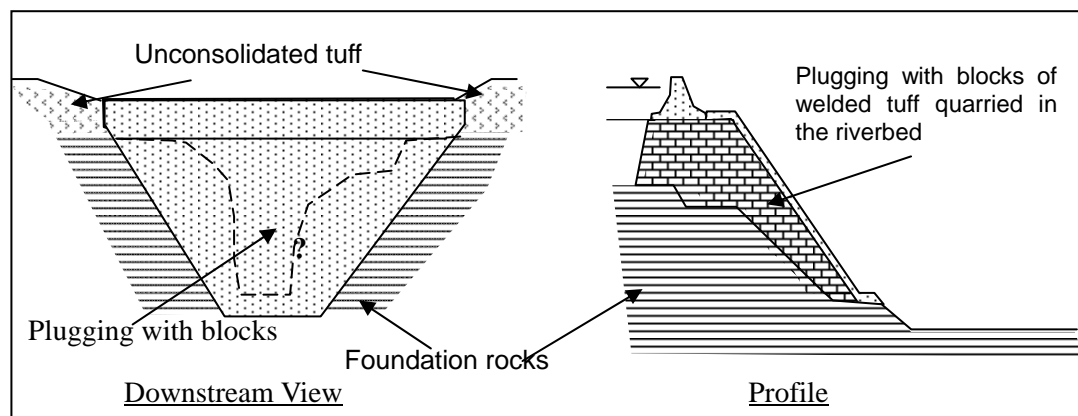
Image of Dam Site Foundation (Source: JICA Study Team)
